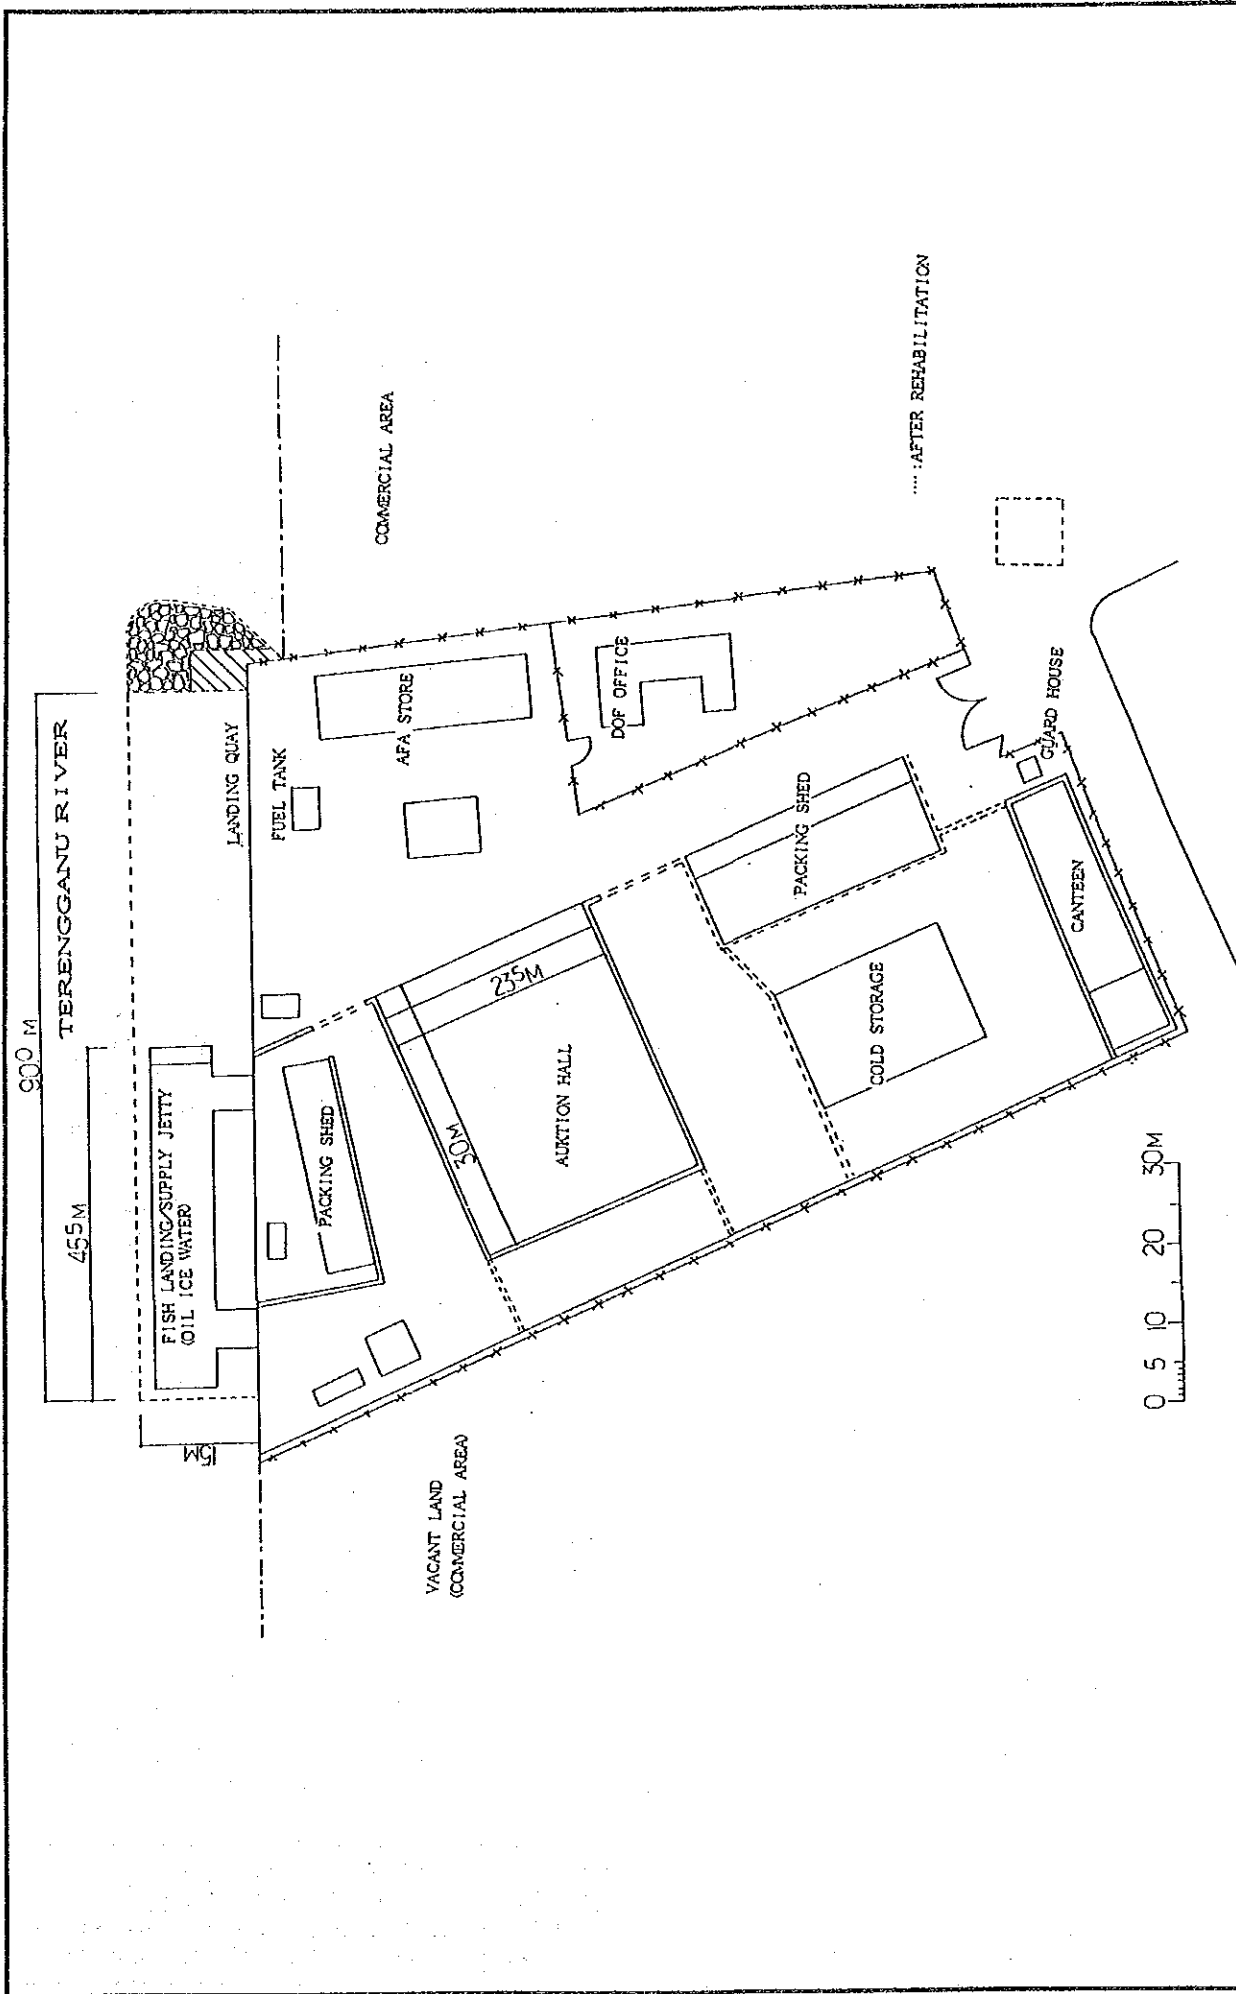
General Layout Plan of LKIM Complex of Pulau Kambing
